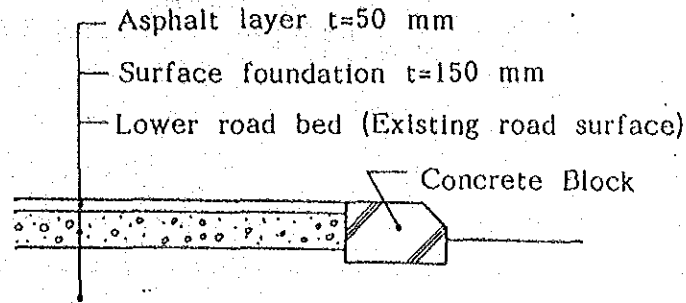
Standard Sectional Plan for the Asphalt Road
